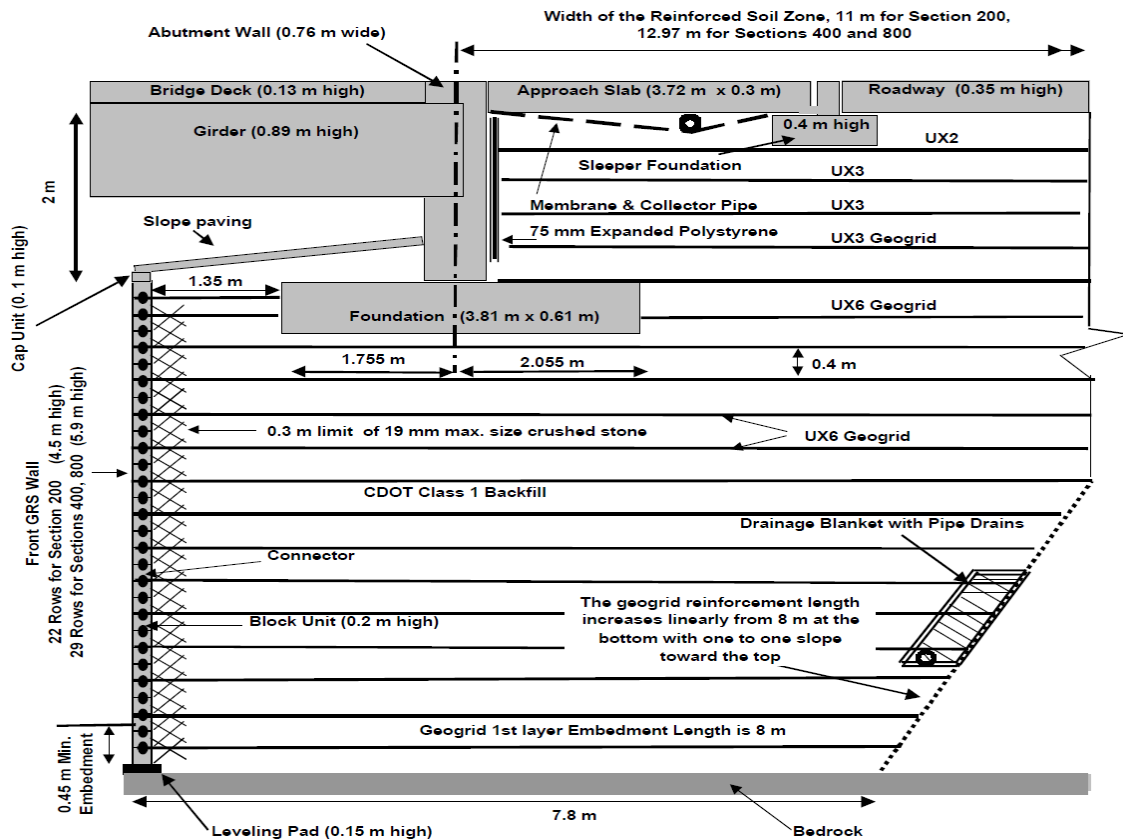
Founders/Meadows Composite GRS Abutment Schematic Abu-Hejleh, N., Outcalt, W., Wang, T., and Zornberg, J. G. (2000a). "Performance of Geosynthetic Reinforced Walls Supporting the Founders/Meadows Bridge and Approaching Roadway Structures - Report 1: Design, Materials, Construction, Instrumentation, and Preliminary Results." CDOT-DTD-R-2000-5, Colorado Department of Transportation, Denver, CO. Used under fair use, 2014.
